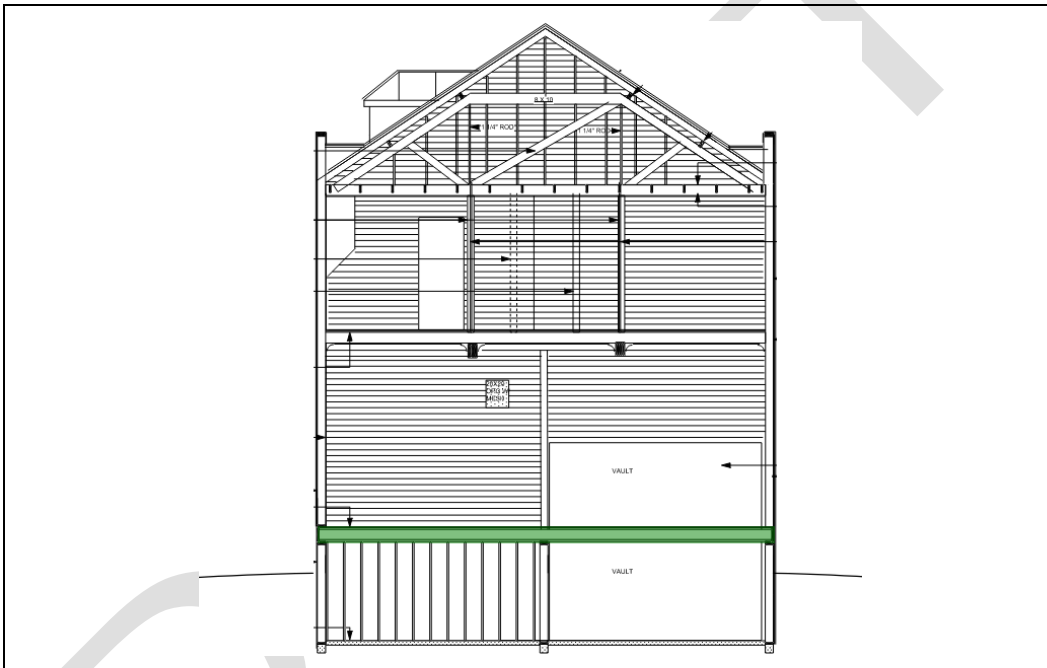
Insulated floor assembly at ground floor, insulation is installed between the floor joists and a ceiling finish at the basement. Below grade walls would remain uninsulated with this approach. Placement of the plane of the insulation is shaded green (drawing underlay source: Keay Architecture Ltd.).
